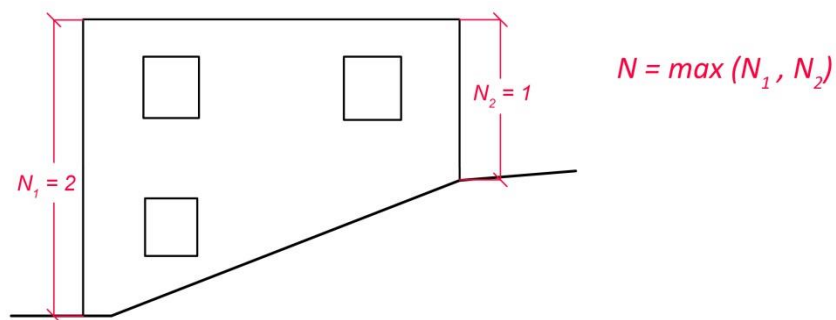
In the case of difference in height along the wall length because of the building being built in a slope, the maximum number of floors observed in the wall should be adopted (elevation view)
